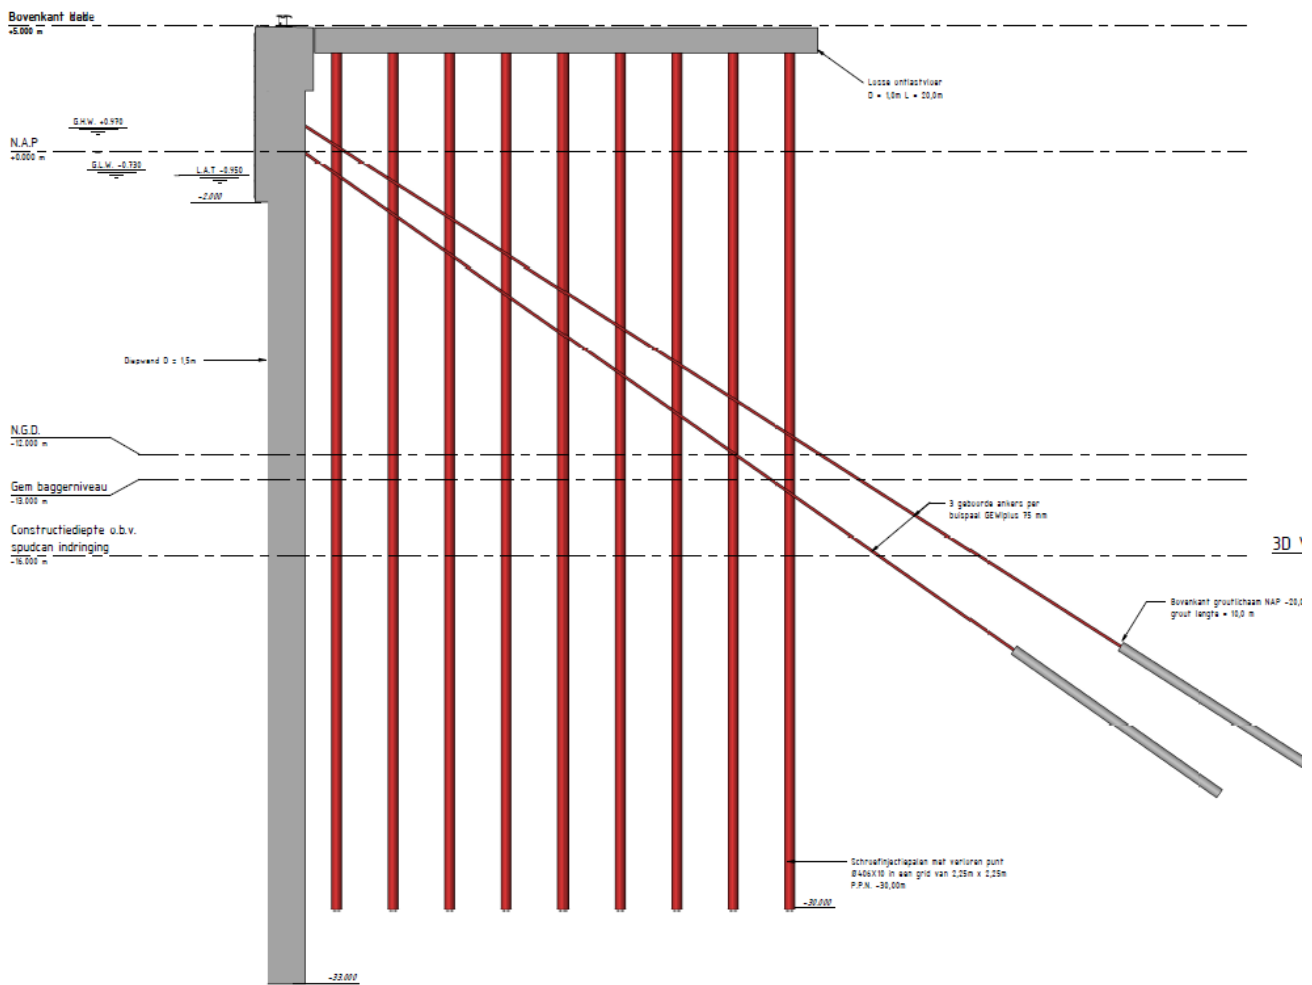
Diaphragm wall combined with a deck on piles example design (Witteveen en Bos, 2021).
